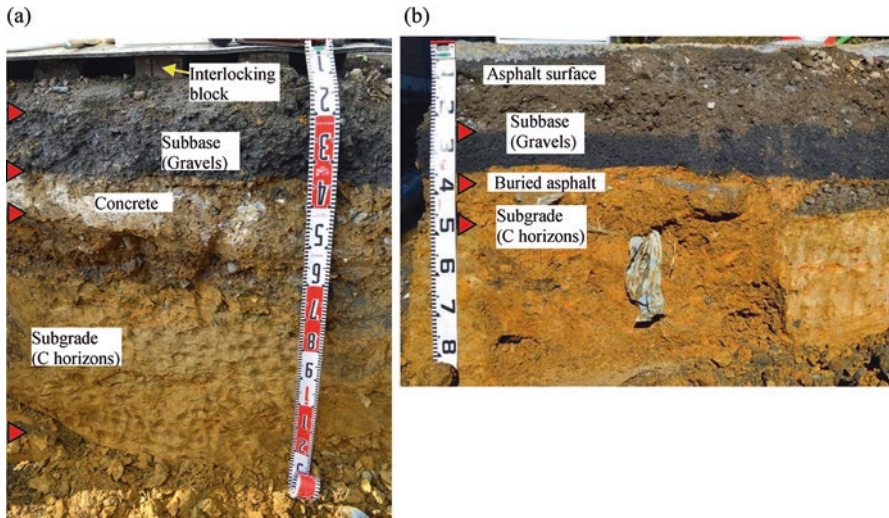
Photo (a) shows the soil profile beneath the interlocking pavement. Photo (b) shows an artificially piled soil profile beneath asphalt pavement. Interlayers consisting of concrete and asphalt were observed to enhance the bearing capacity to traffic load. Red closed triangles on the profiles indicate the border between layers in the soil profiles
